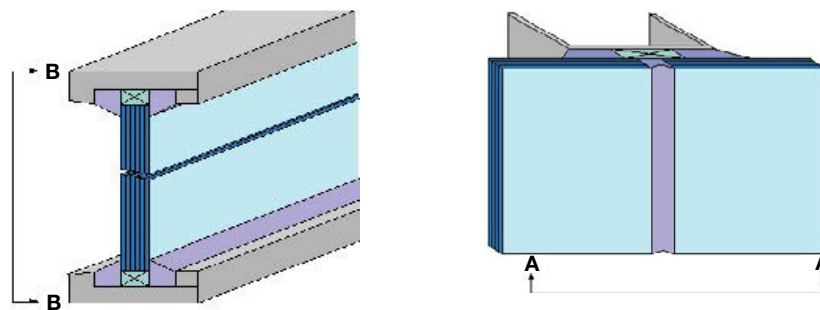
Typical two (2) sided structural glazing system where mullion details (right side) using structural sealant glazing with mechanical captive at glass head/sill.
